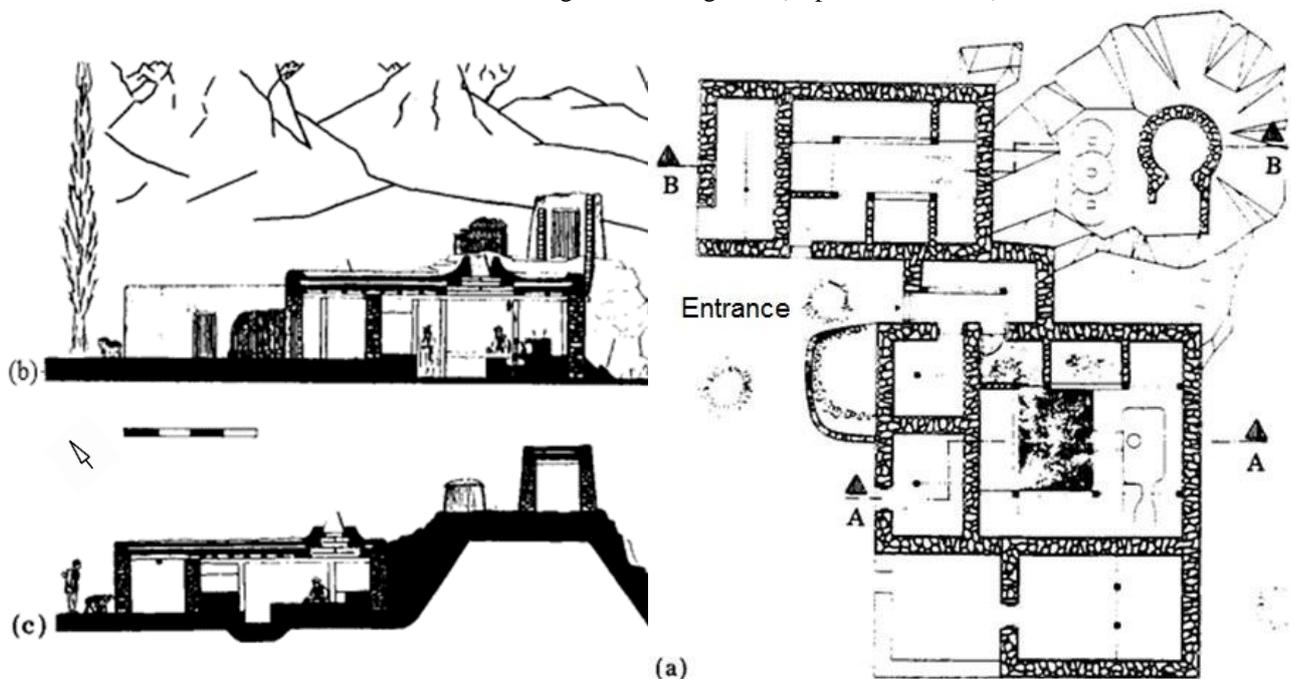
A house in Wark village in Wakhan Valley, a) Plan (b) section A-A (c) section B-B (Supic, 1982)
